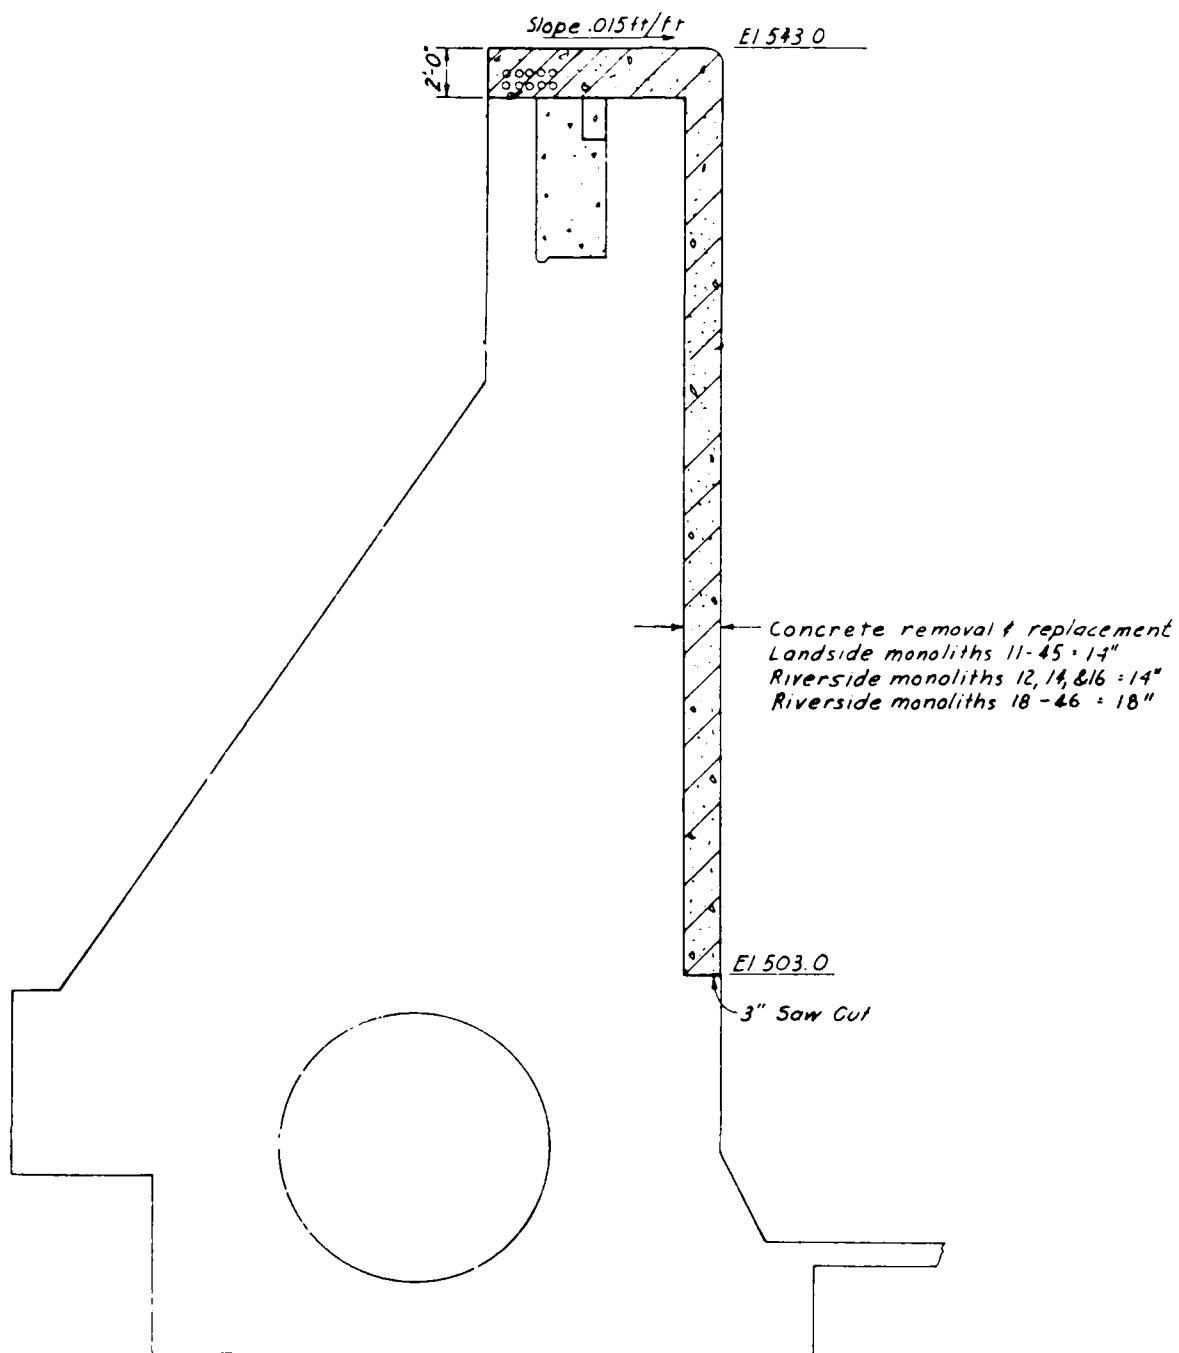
Resurfacing details, chamber monoliths, Brandon Road Lock
